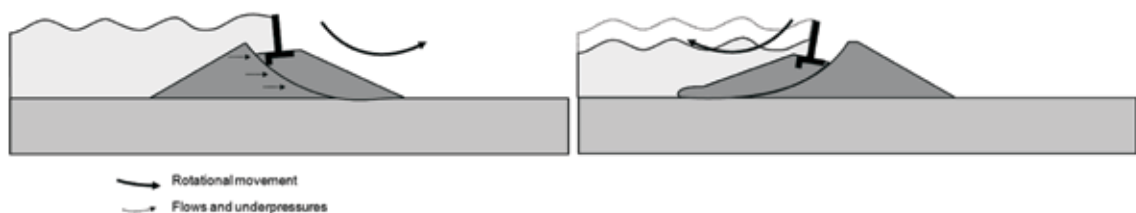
Shallow rotational sliding affecting a wall at levee crest (courtesy Y Deniaud, CETMEF)
